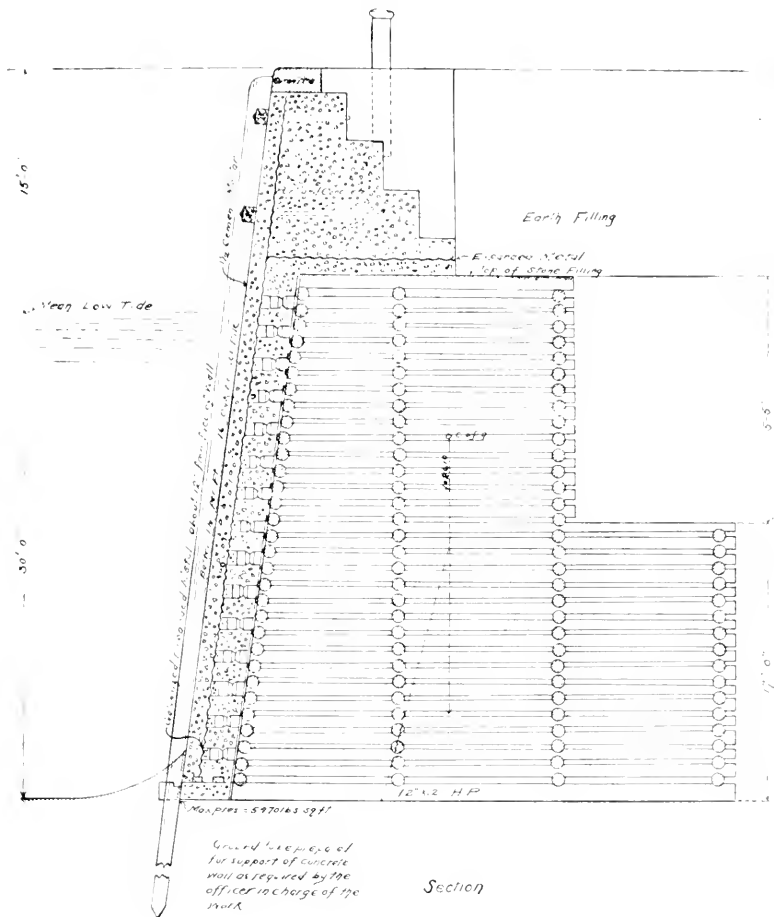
RETAINING WALL AT THE NEW DOCK FOR THE JOINT USE OF THE F. R. R. CO. AND THE UNITED STATES NAVY YARD, BOSTON, MASS., SHOWING THE USE OF CONCRETE AND EXPANDED METAL.
